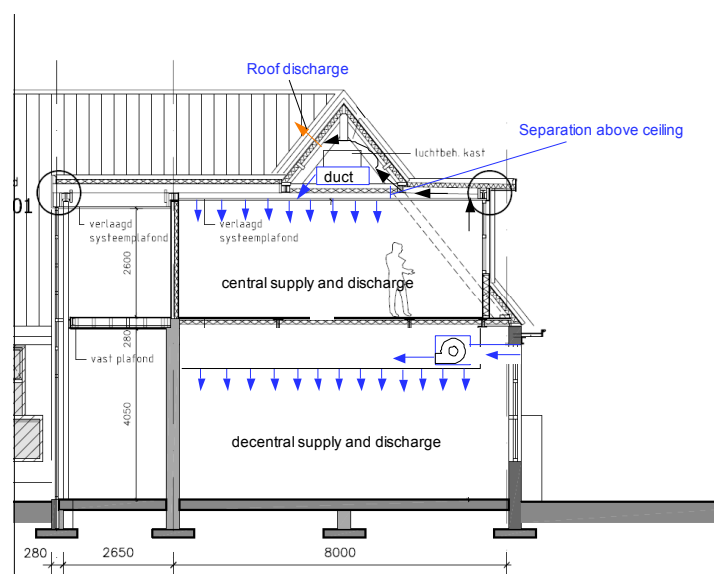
Sliedrecht, ground floor: decentral supply and discharge through façade. First floor: central supply duct and discharge through attic.
